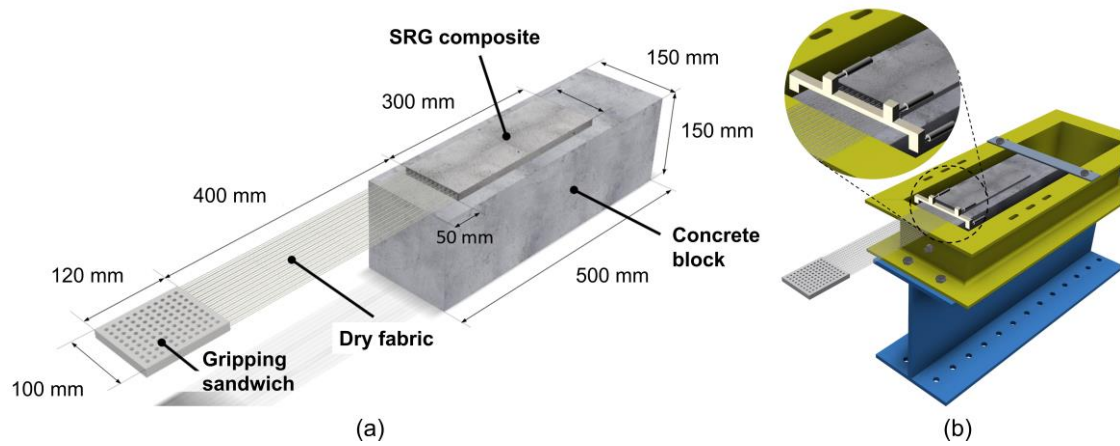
(a) Geometry of specimens and (b) setup of single-lap shear bond test with a zoomed view on the loaded area.
